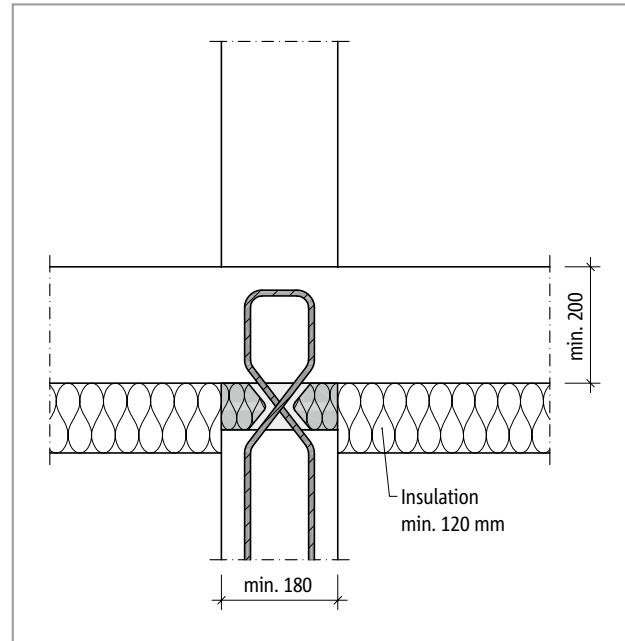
Schöck Sconnex® type W: R 30 / EI 0 with internal wall and under-slab insulation without fire protection measures
